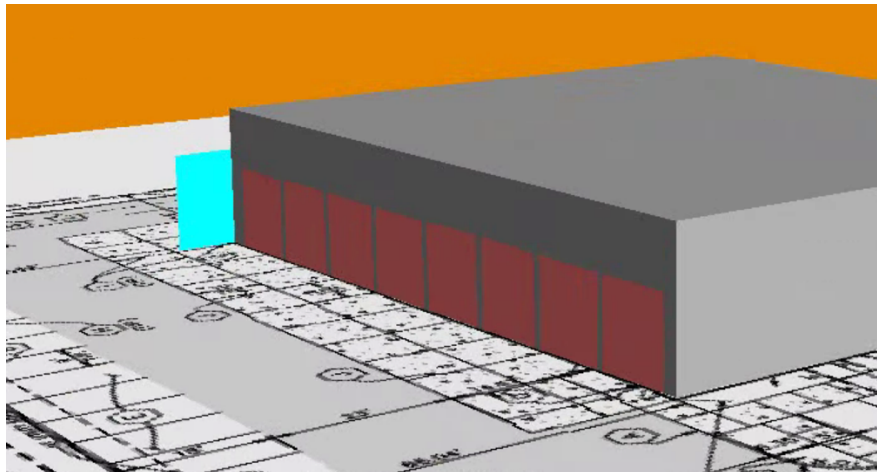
SoundPlan 3D View - Wall at Northeast Corner
